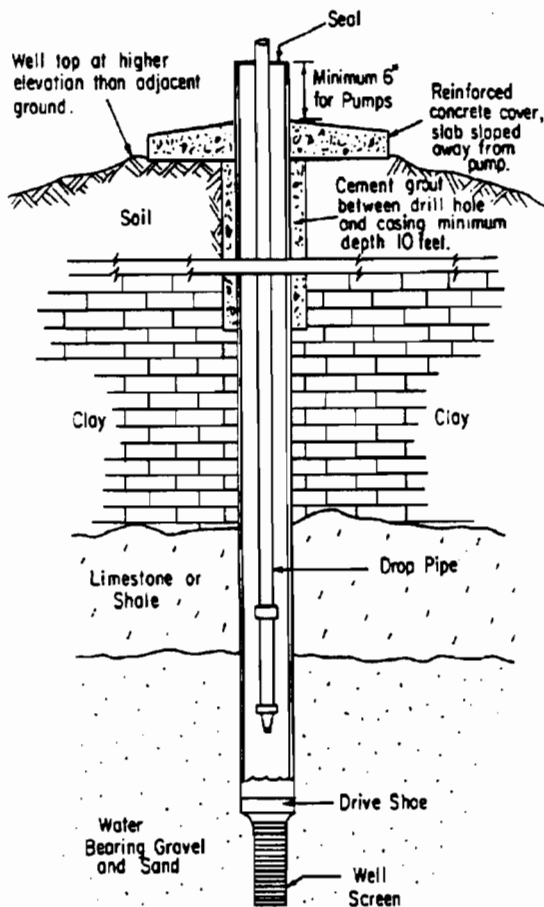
Proper construction of a drilled well obtaining water from sand or gravel [1].
